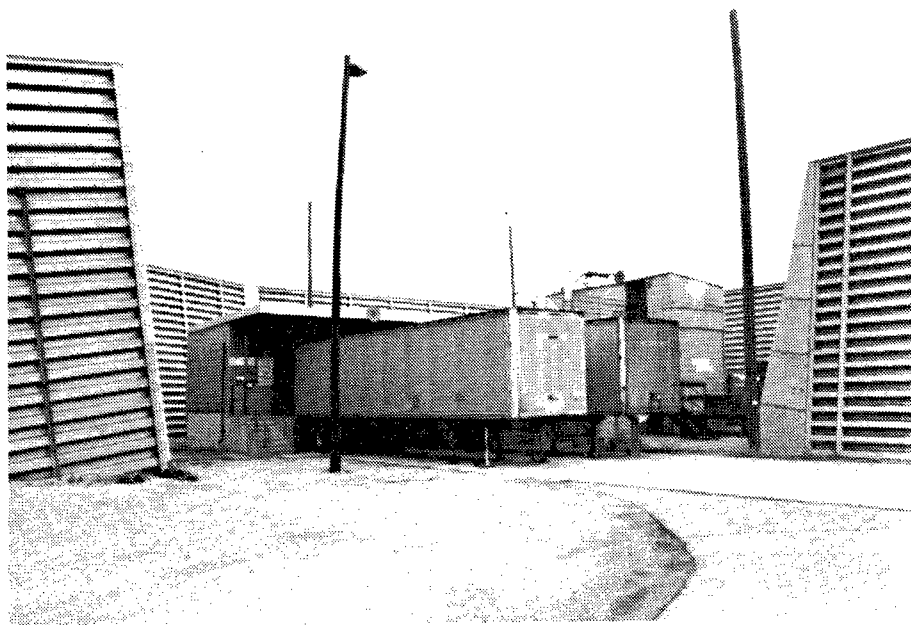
Building N2: Explosives Manufacturing Plant, Packaging Building.
